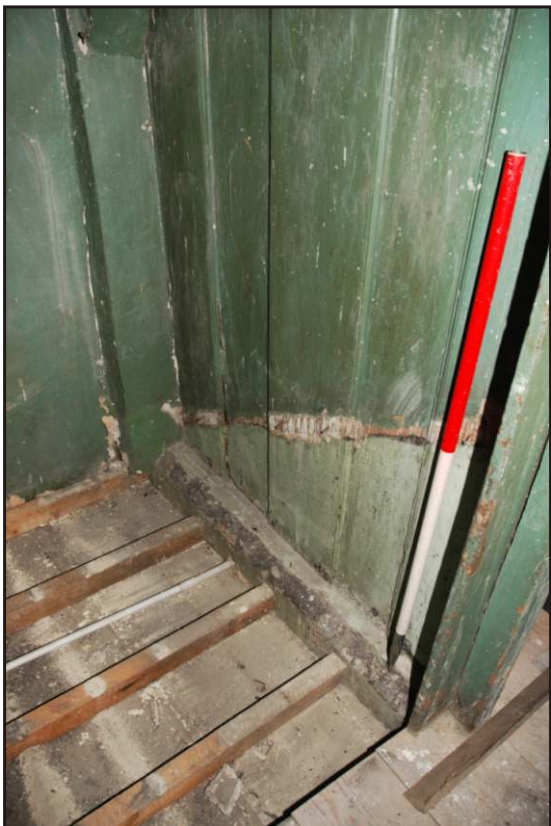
Remains of former stairwell in attic of Wharfinger's House. Looking north west (scale 1m).
